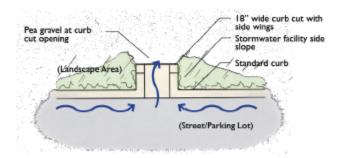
Standard curb cut with side wings: plan view (Source: SMCWPPP 2009)
